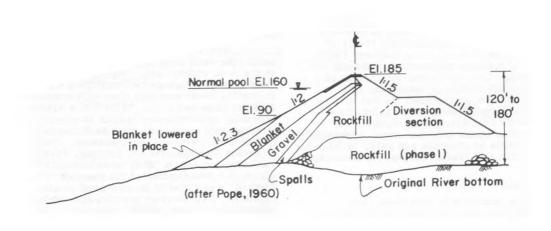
Typical Cross Section of The Dalles Closure Dam, U.S.A.
